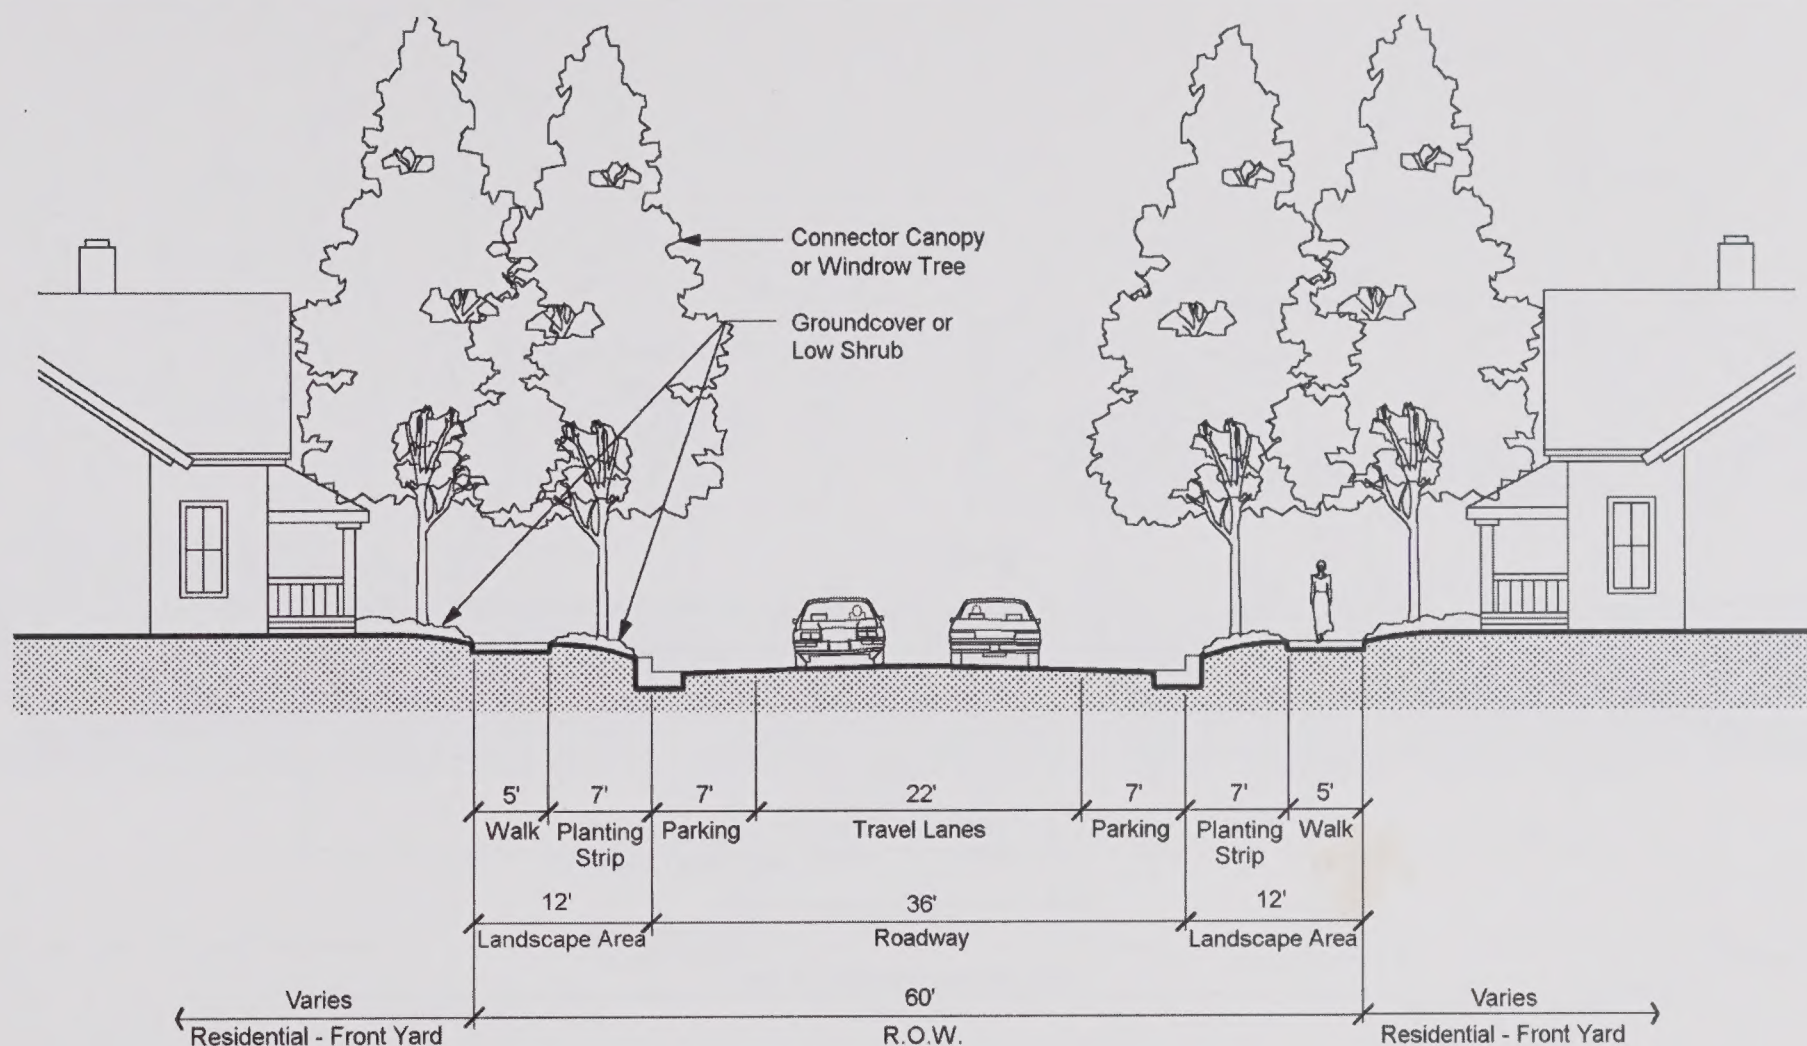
SECTION Q – VILLAGE CORE CONNECTOR STREET (PARALLEL PARKING)
